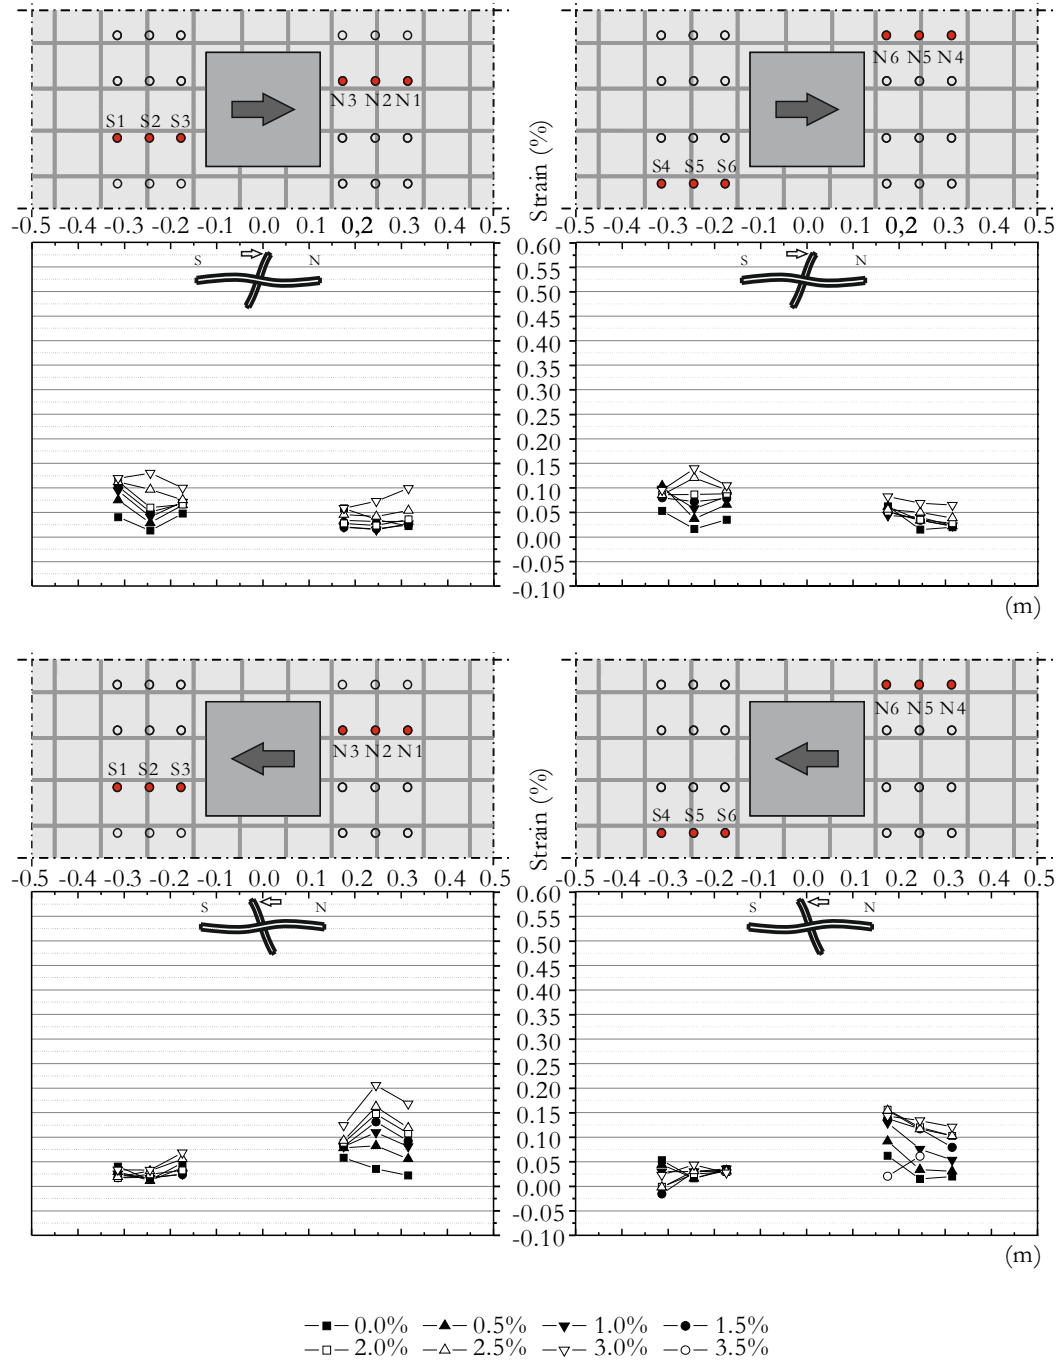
Strains in the shear reinforcement stirrups of the C-50 STR2 specimen.
